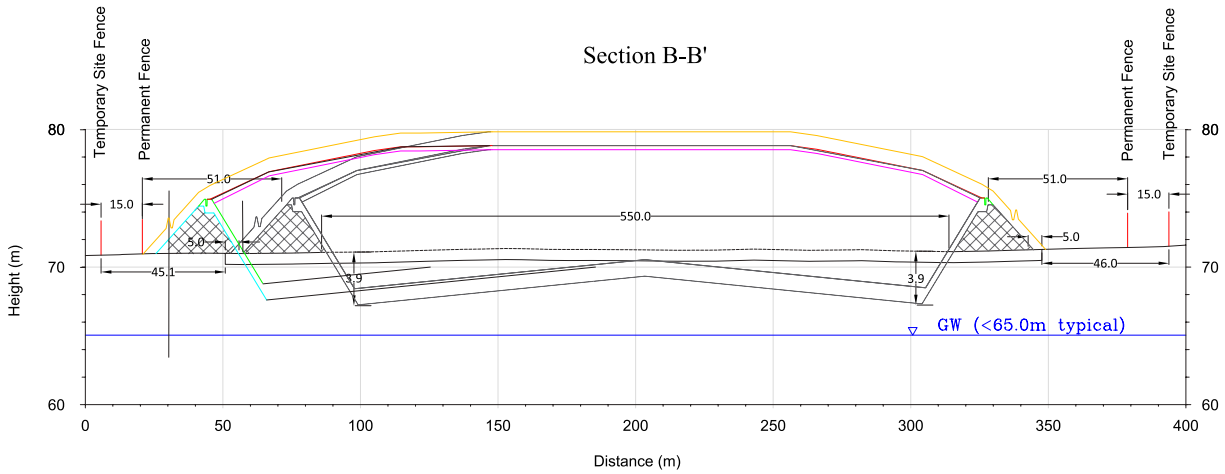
Landfill Cross Section of the Landfill - Width
